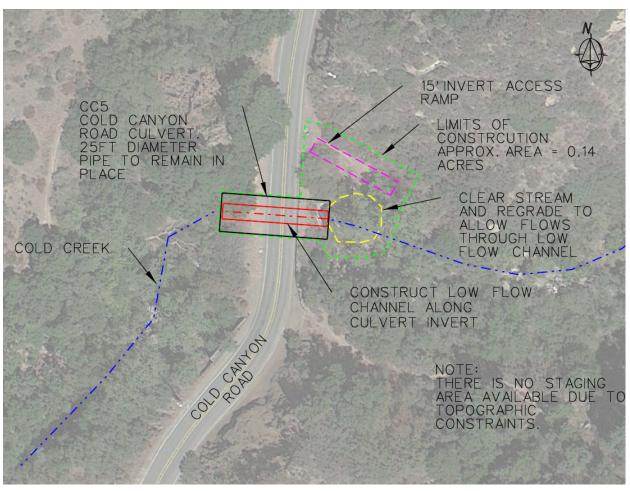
CC5, Cold Canyon Road Culvert Schematic Design
